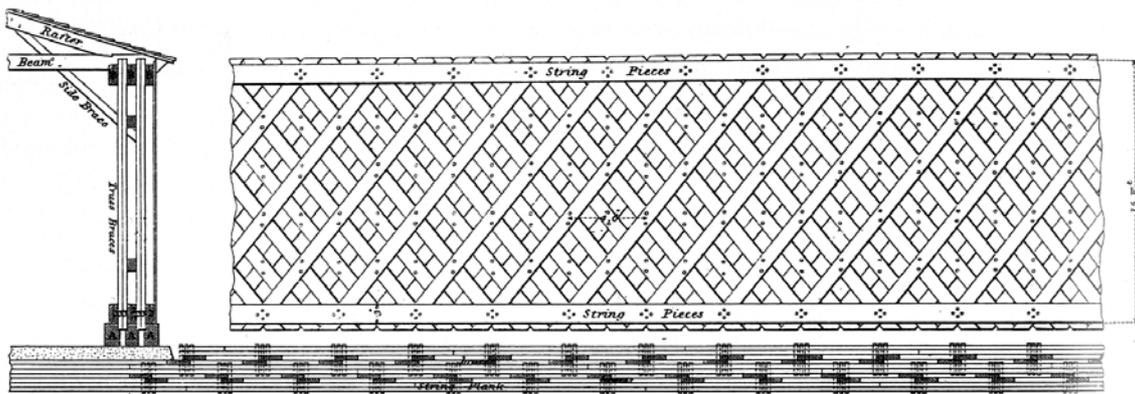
Town lattice bridge, Ithial Town, patented 1820. (Peters¹)
